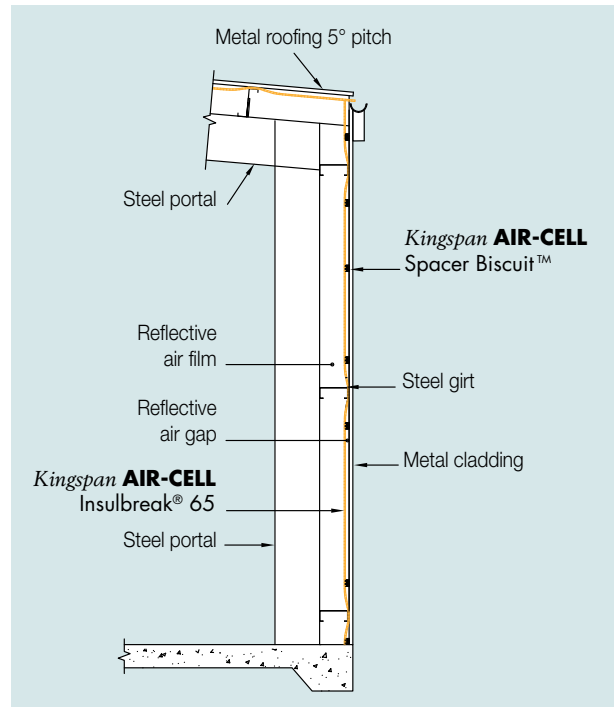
Side elevation of Kingspan AIR-CELL Insulbreak® 65 in a warehouse wall installation
